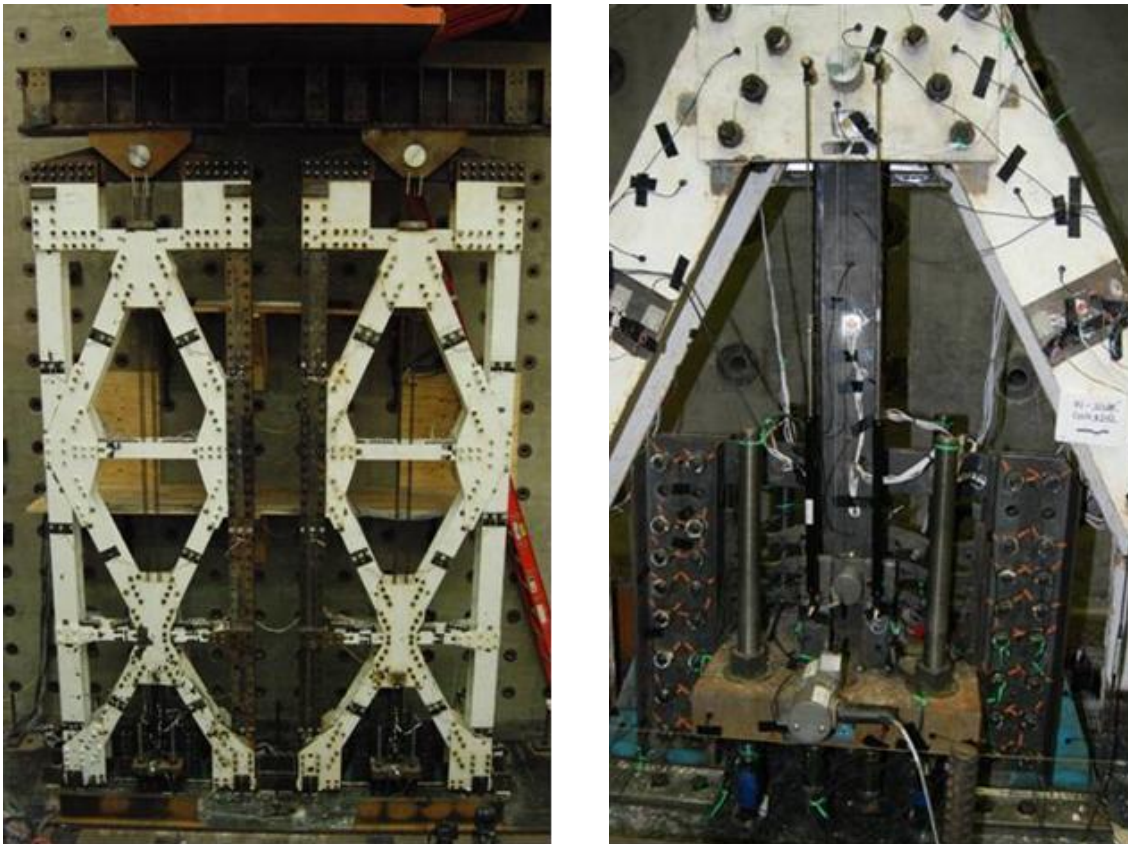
Photograph of Specimen B1 and B2 (Left) and Close-Up Photograph of the Specimen B1 Fuse Assembly (Right)
